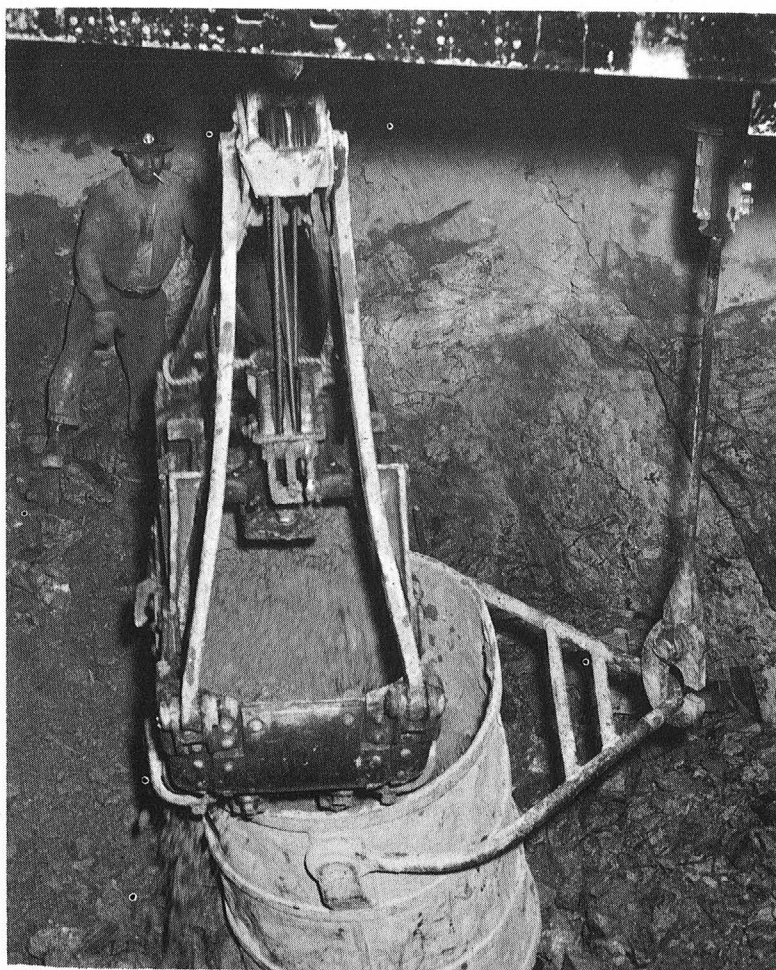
Clamshell-Type Mucker in Operation at Bottom of Shaft.
